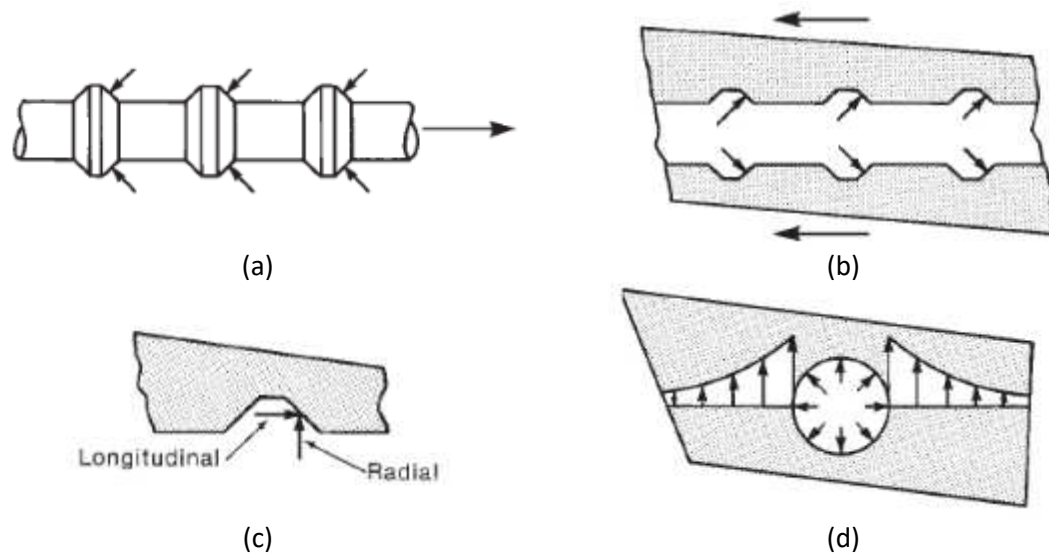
Inclination of bond forces in interlocking bond transfer mechanism: (a): inclined forces on bar; (b) inclined forces on concrete; (c) radial and longitudinal components of force on concrete; and (d) Radial component on concrete and splitting stresses on a section through the bar (Source: (Wight & MacGregor, 2011) rearranged).
